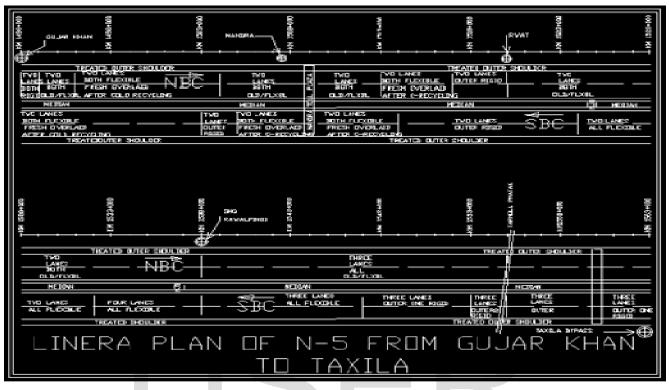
Linear Plan of the Road Section From Gujjar Khan to Taxila
